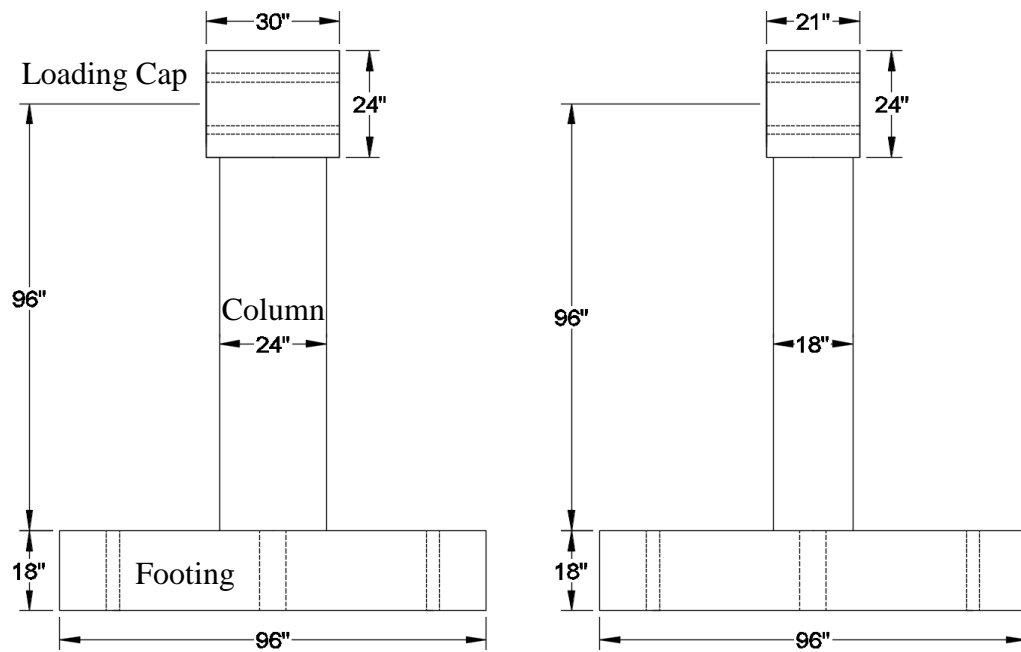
General Dimensions for 24" and 18" Specimens with 8ft Cantilever Lengths
